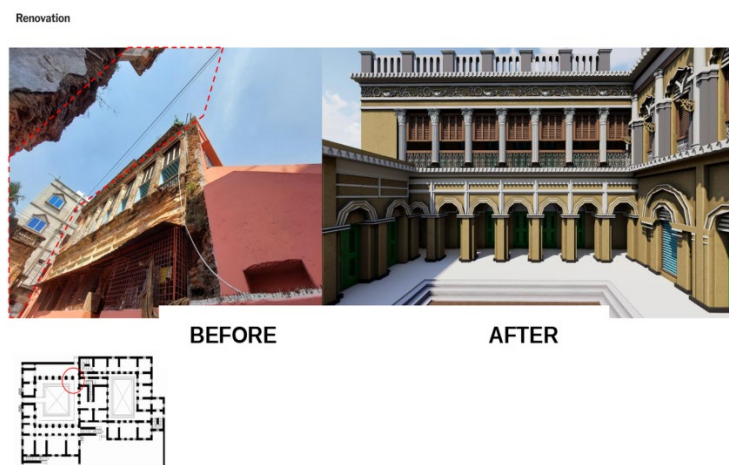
Shows: Haque House Corrected before-and-after visualization of a second façade/courtyard view. The intervention remains conceptual and requires significance and structural assessment.
